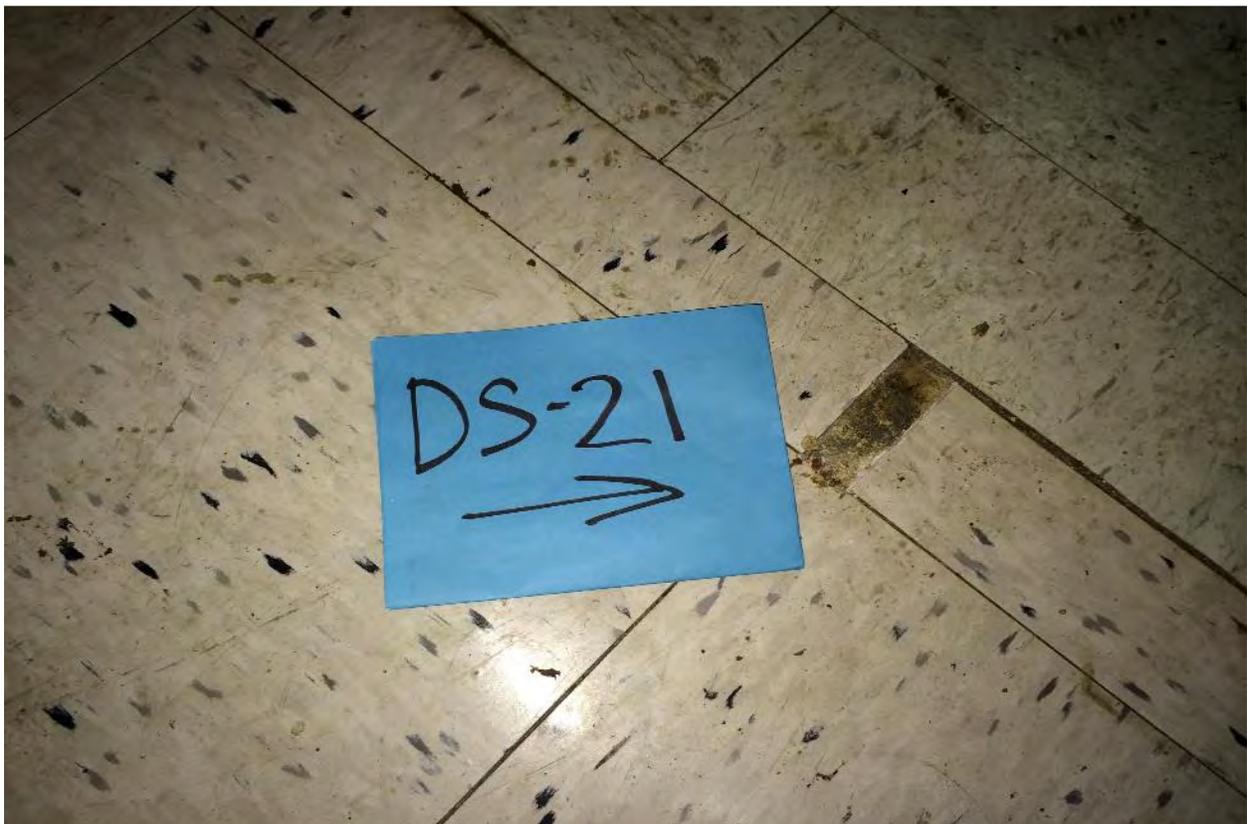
Laboratory analyses did not detect asbestos minerals within the black and white floor tile or mastic sample DS-21 collected from the Dormitory Building downstairs training room.
